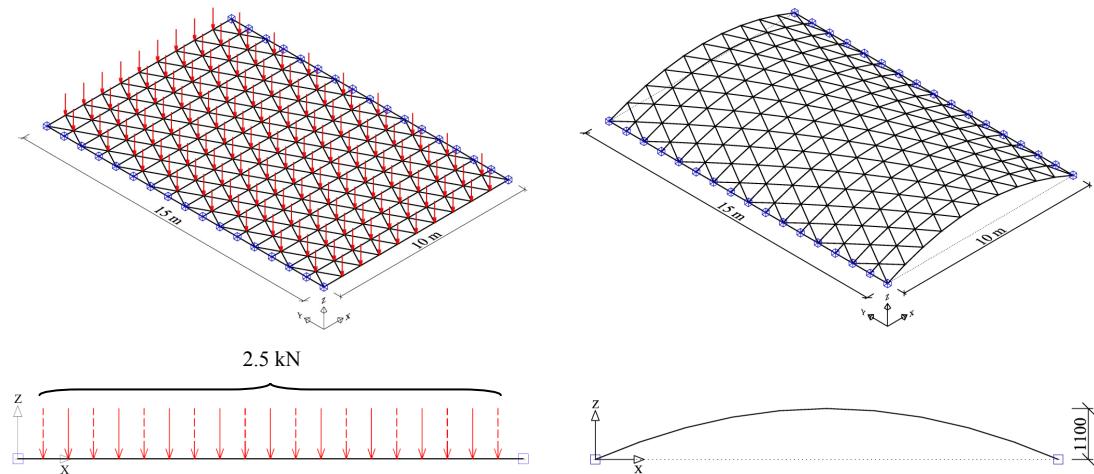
The initial ground plan and the final shape (symmetrical external load)
